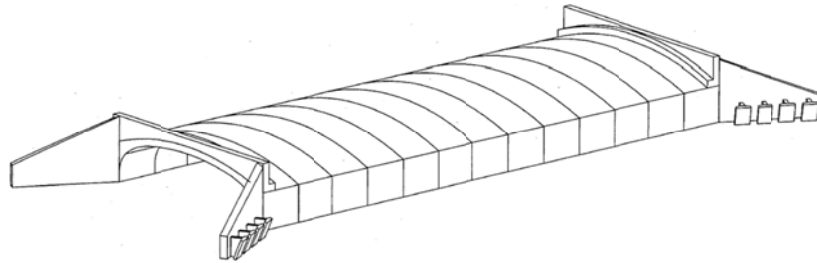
Typical Three-sided Arch Culvert System (FoleyArch 2010)
